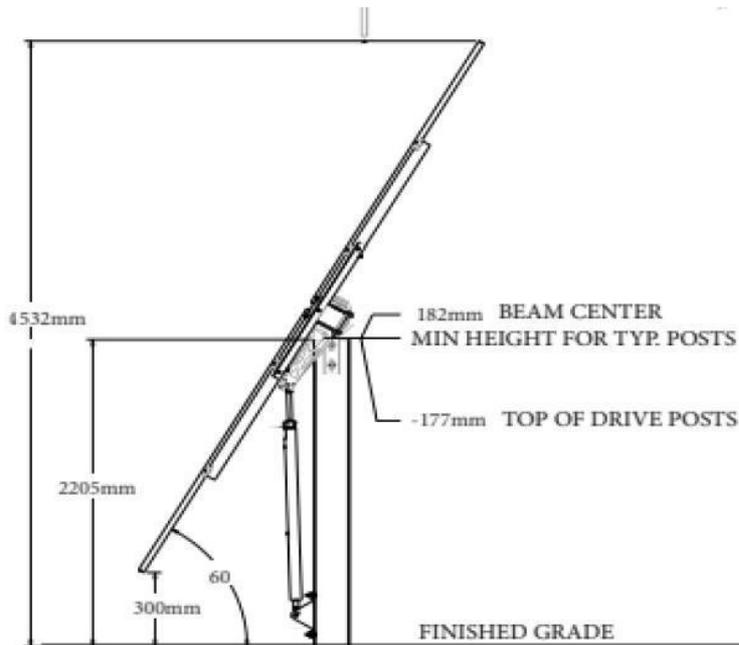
North-south elevation of solar array at maximum tilt. (Source: FNSF, 2022).
